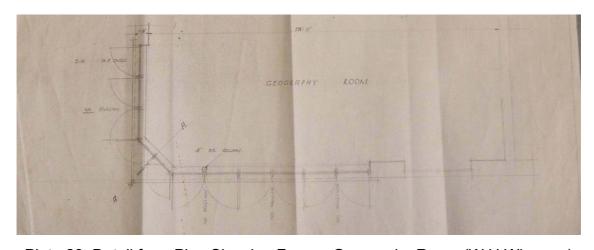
Detail from Plan Showing Former Geography Room (W H Wingage)
